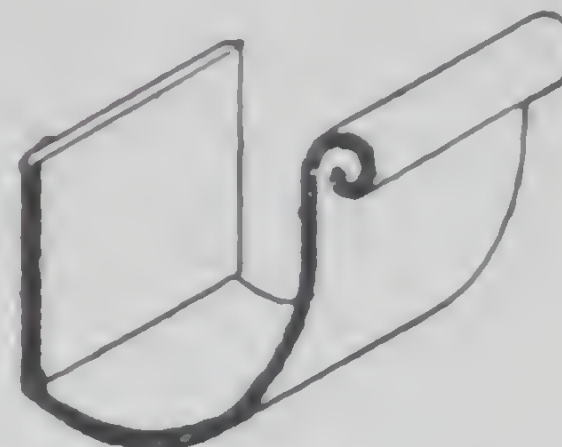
DETAILS SHOWING EAVES TROUGH WITH LAP JOINT FIG. 3
